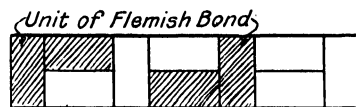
FLEMISH BOND: ONE-BRICK WALL
